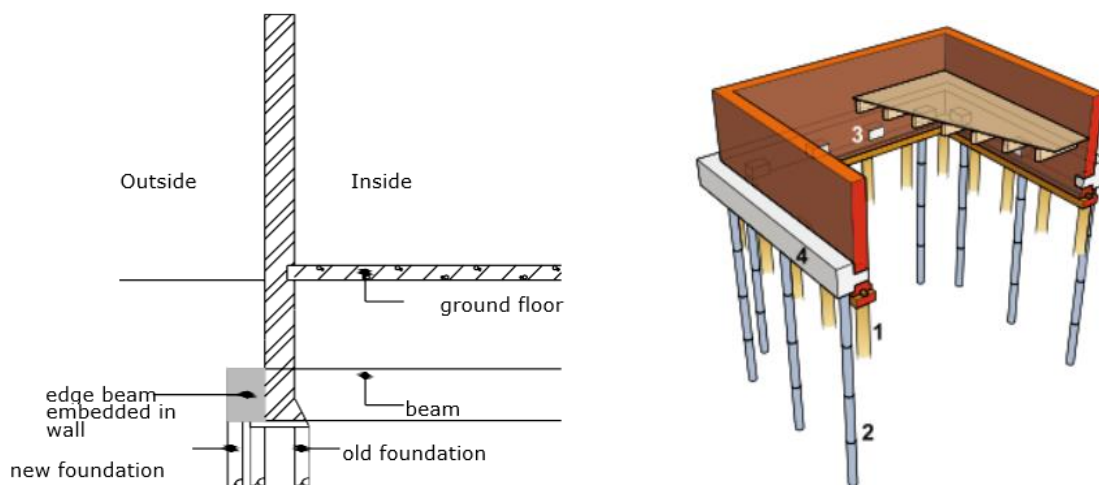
Left: schematic section of edge beam; right, 1) old wooden piles, 2) new piles, 3) support for the new edge beam, 4) new edge beam (van Etten et al., 2007; VROM, n.d.)
